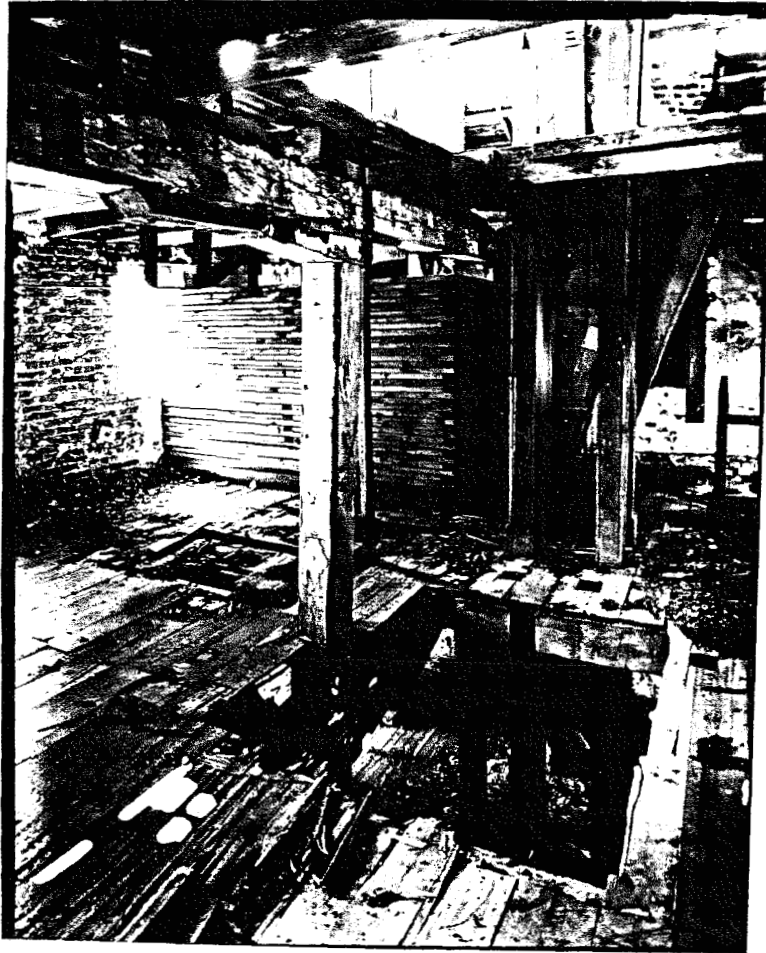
DUCK CREEK MILL, INTERIOR SECOND FLOOR
